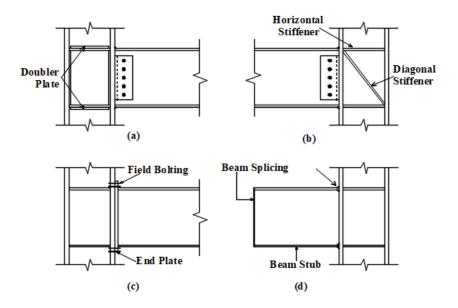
Full restrained connections a) Double plate welded and bolted connection. b) Diagonal stiffen welded and bolted connection. c) Endplate with bolt connections. d) Beam stub welding to the column.
